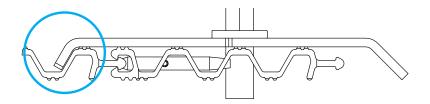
Leading Edge Anchor Plate placed into groove of C40 / C90 Trackway®
